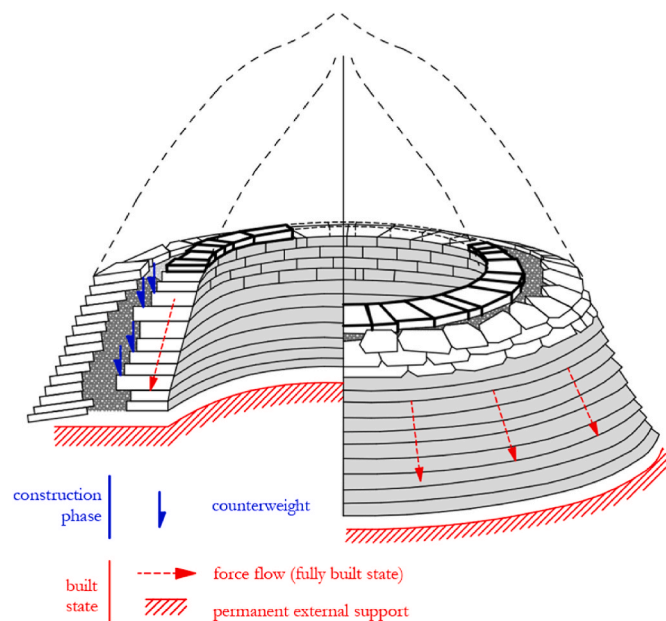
Corbelling structural schematic in the construction of a drystone hut showing the counterweight force necessary to balance cantilevered layers during construction (adapted from (Lassure, 2009)).
